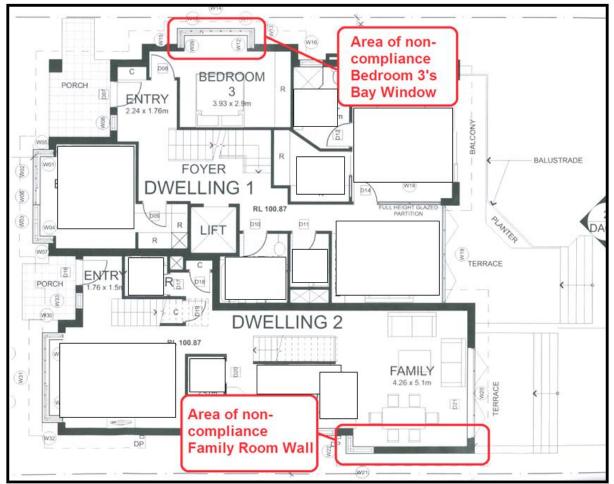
Image showing the Ground Level floor plan of 9 Eric Street, Eastwood with highlighted areas along the Eastern and Western sides of the development demonstrating where the setbacks do not comply.
